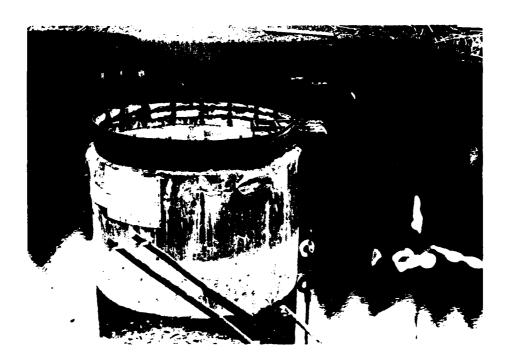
Spillway crest and upper portion of riser.
